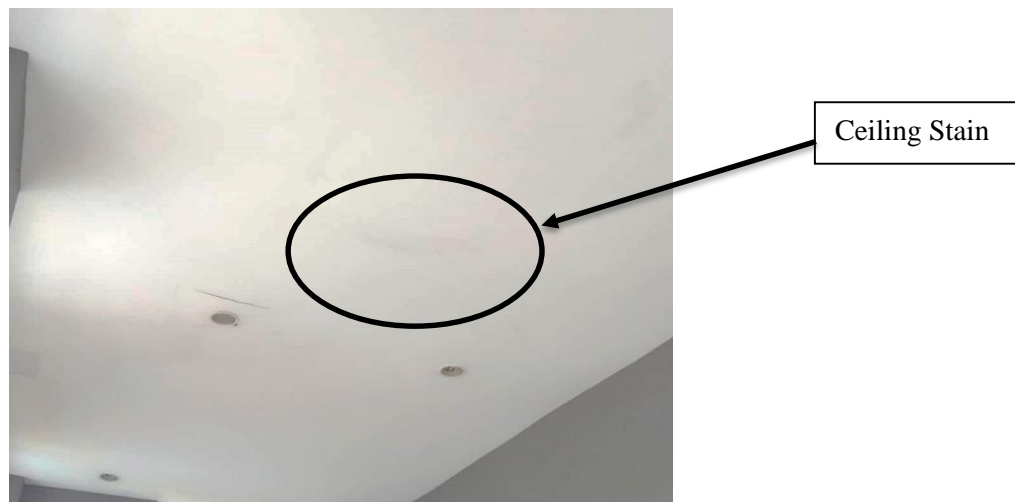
Ceiling Stain Defect at Mentakab Starmall, Pahang
